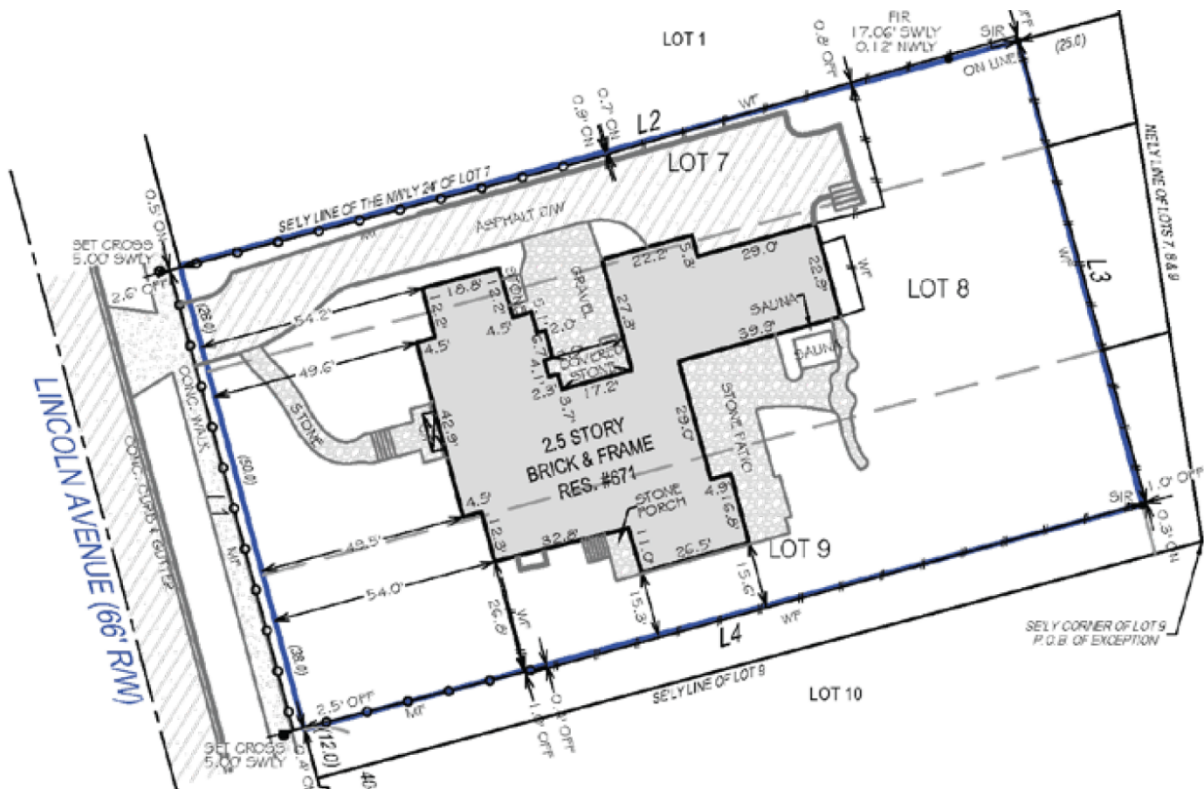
Subject Property – 2025 Plat of Survey Showing Existing Conditions
